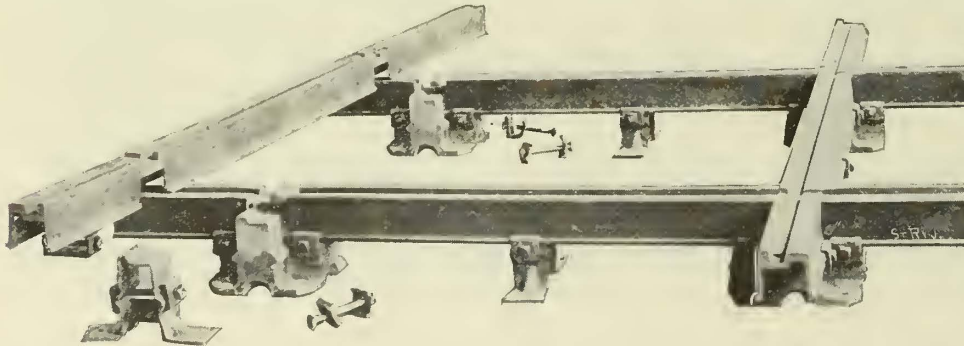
LEWIS & FOWLER GIRDER RAIL CROSSING WITH ONE RAIL REMOVED.
